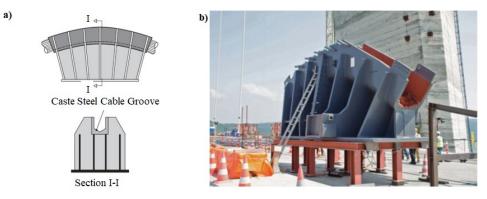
a) Schematic view of the saddle with a cast iron groove; b) Appearance of the saddle with a cast iron groove
